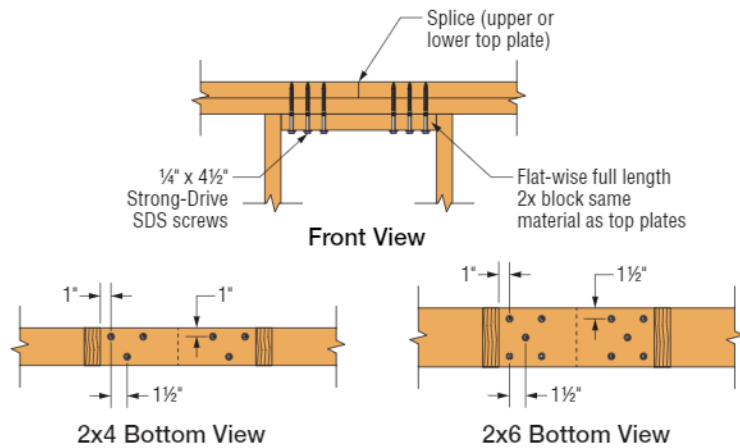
Top-Plate Splice: Reinforcement (Splice Between Studs)
